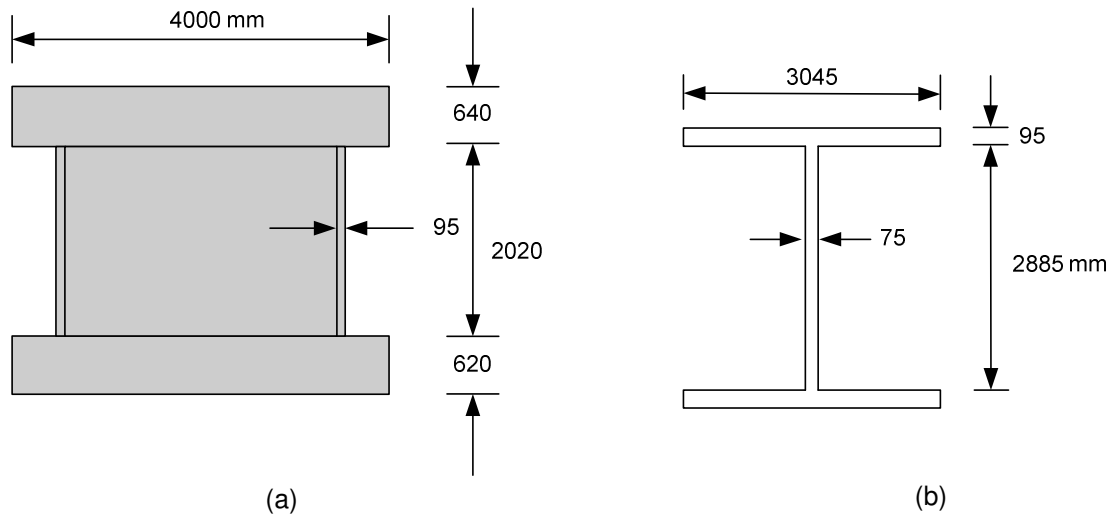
Details of Wall DP1: (a) dimensional details; (b) sectional details.
